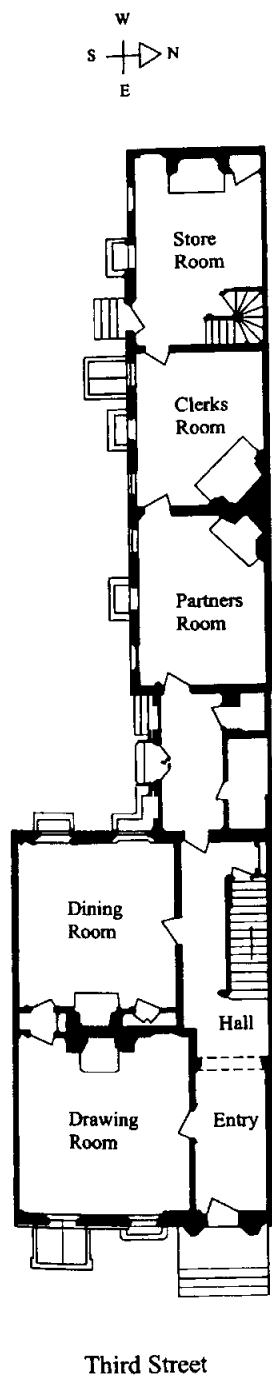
First-floor plan of Charles Stedman house, Philadelphia, built 1765.
